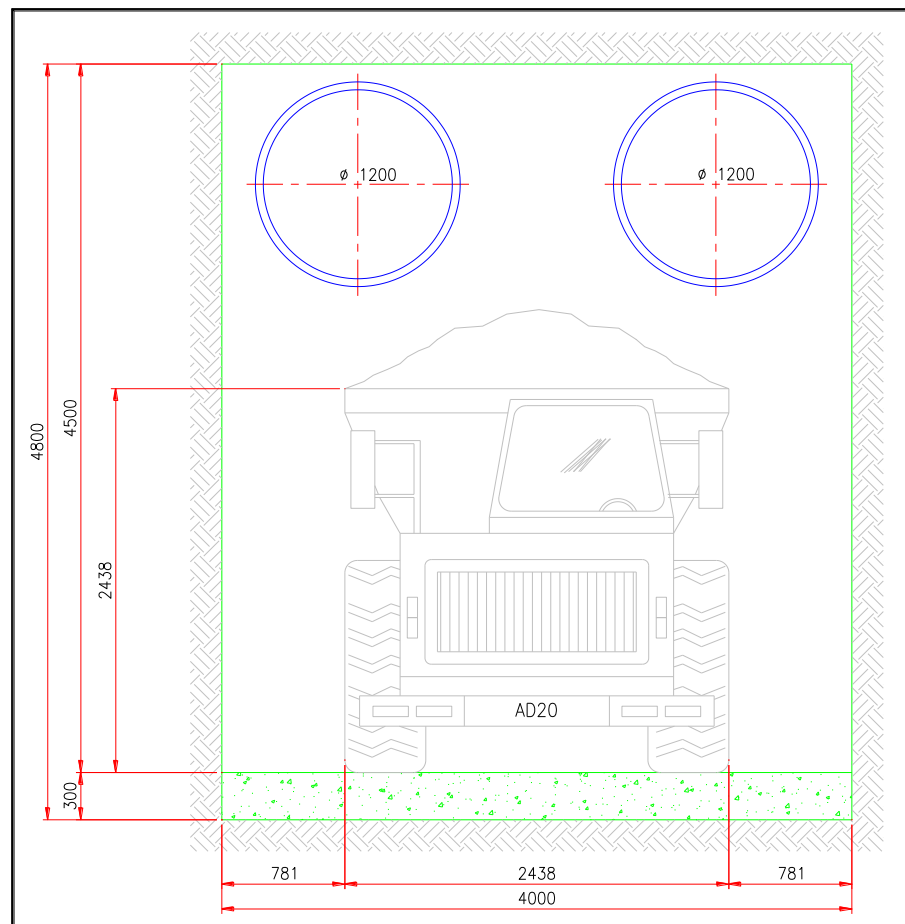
TYPICAL FOOTWALL DRIVE LAYOUT
